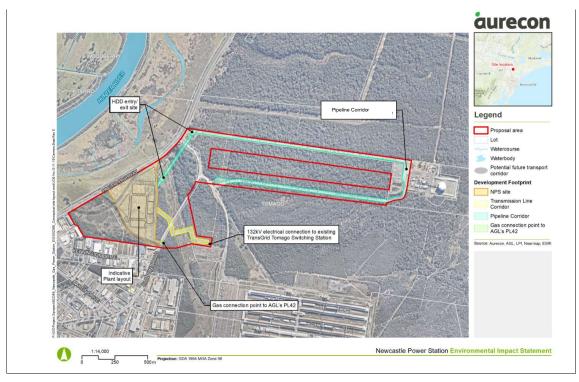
Overall Proposal Layout Plan and tie-in to existing utilities
